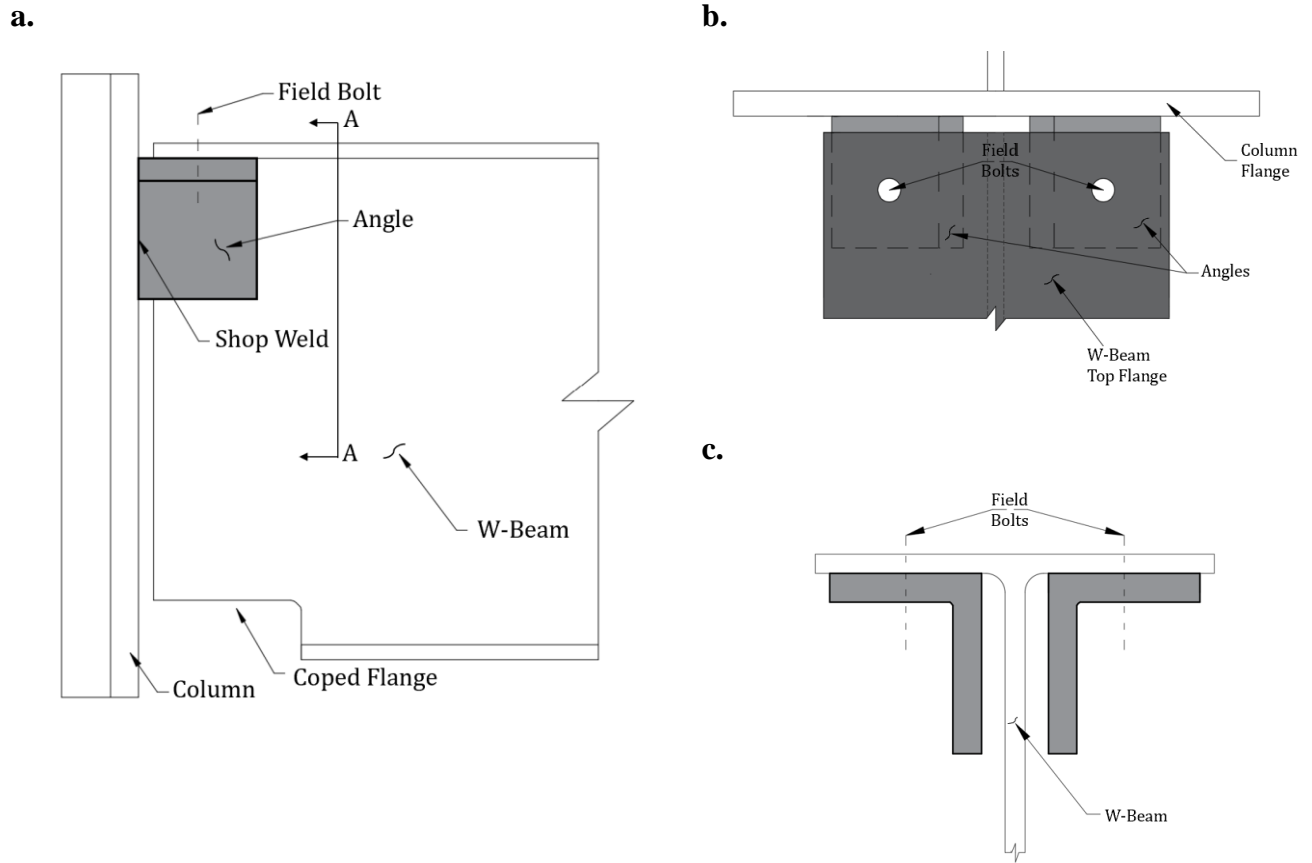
SpeedConnect Drop-In Connection (a) Elevation View (b) Plan View and (c) Cross-Section A-A
